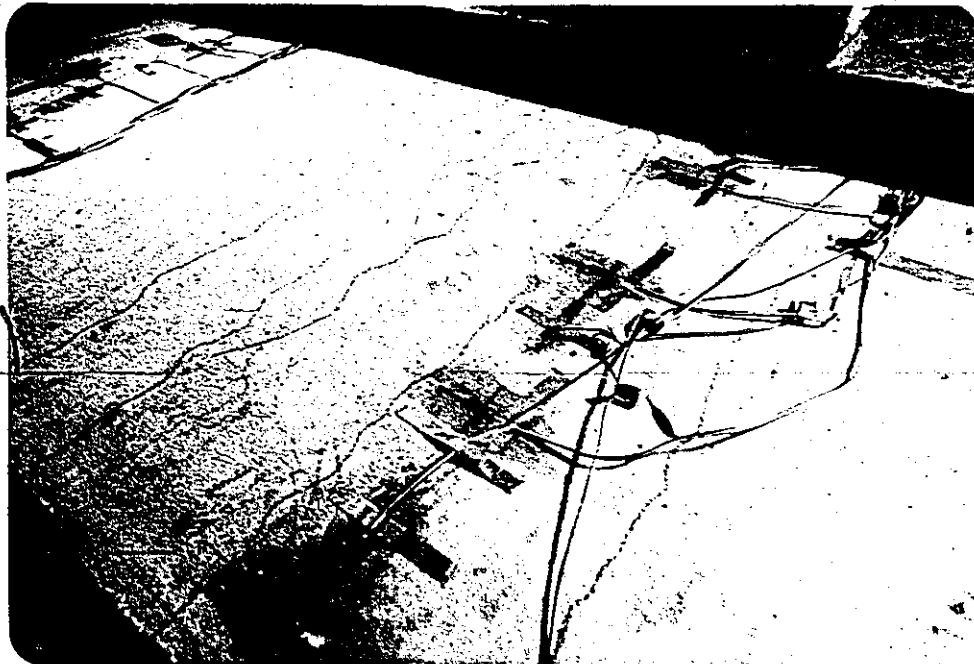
TRANSVERSE CRACKS AT THE INTERMEDIATE SUPPORT ON THE RIGHT SIDE OF LOADED BEAM, BRIDGE MODEL (I), (AT LOAD OF 50 KIPS)
